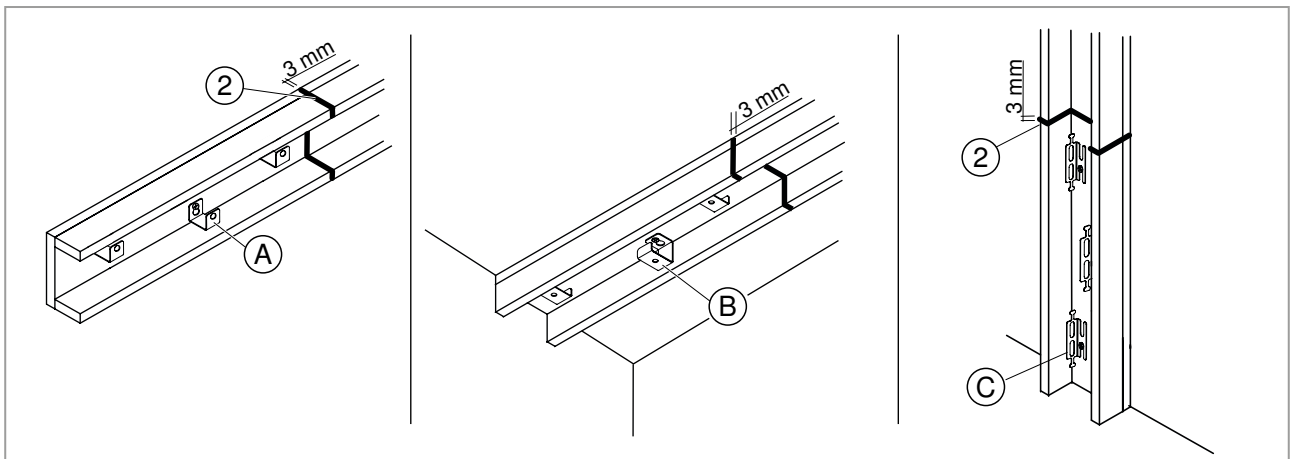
Wall mounting with separating brackets (A), ceiling mounting with separating clamps (B), vertical mounting with cable fixing device (C)
